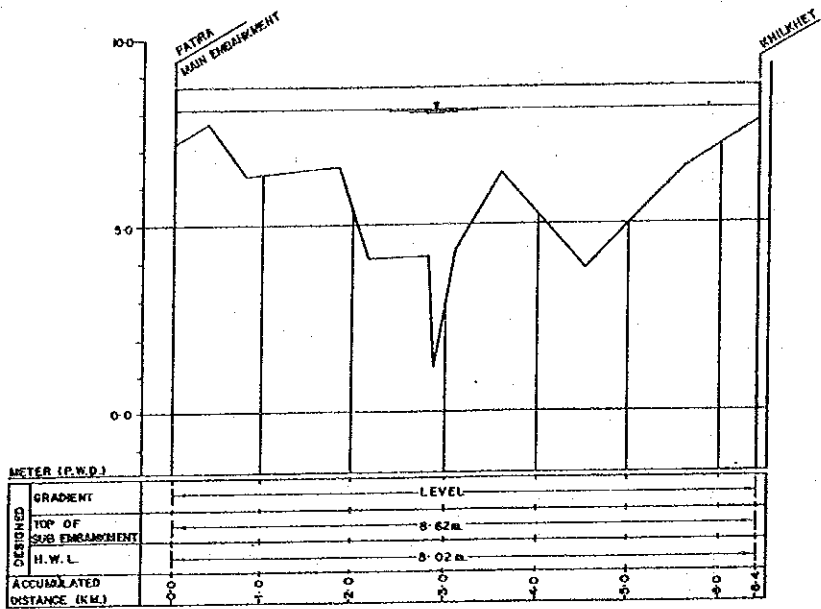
(3) LONGITUDINAL SECTION OF EMBANKMENT : DHAKA EAST (SA, SB AND SC)
